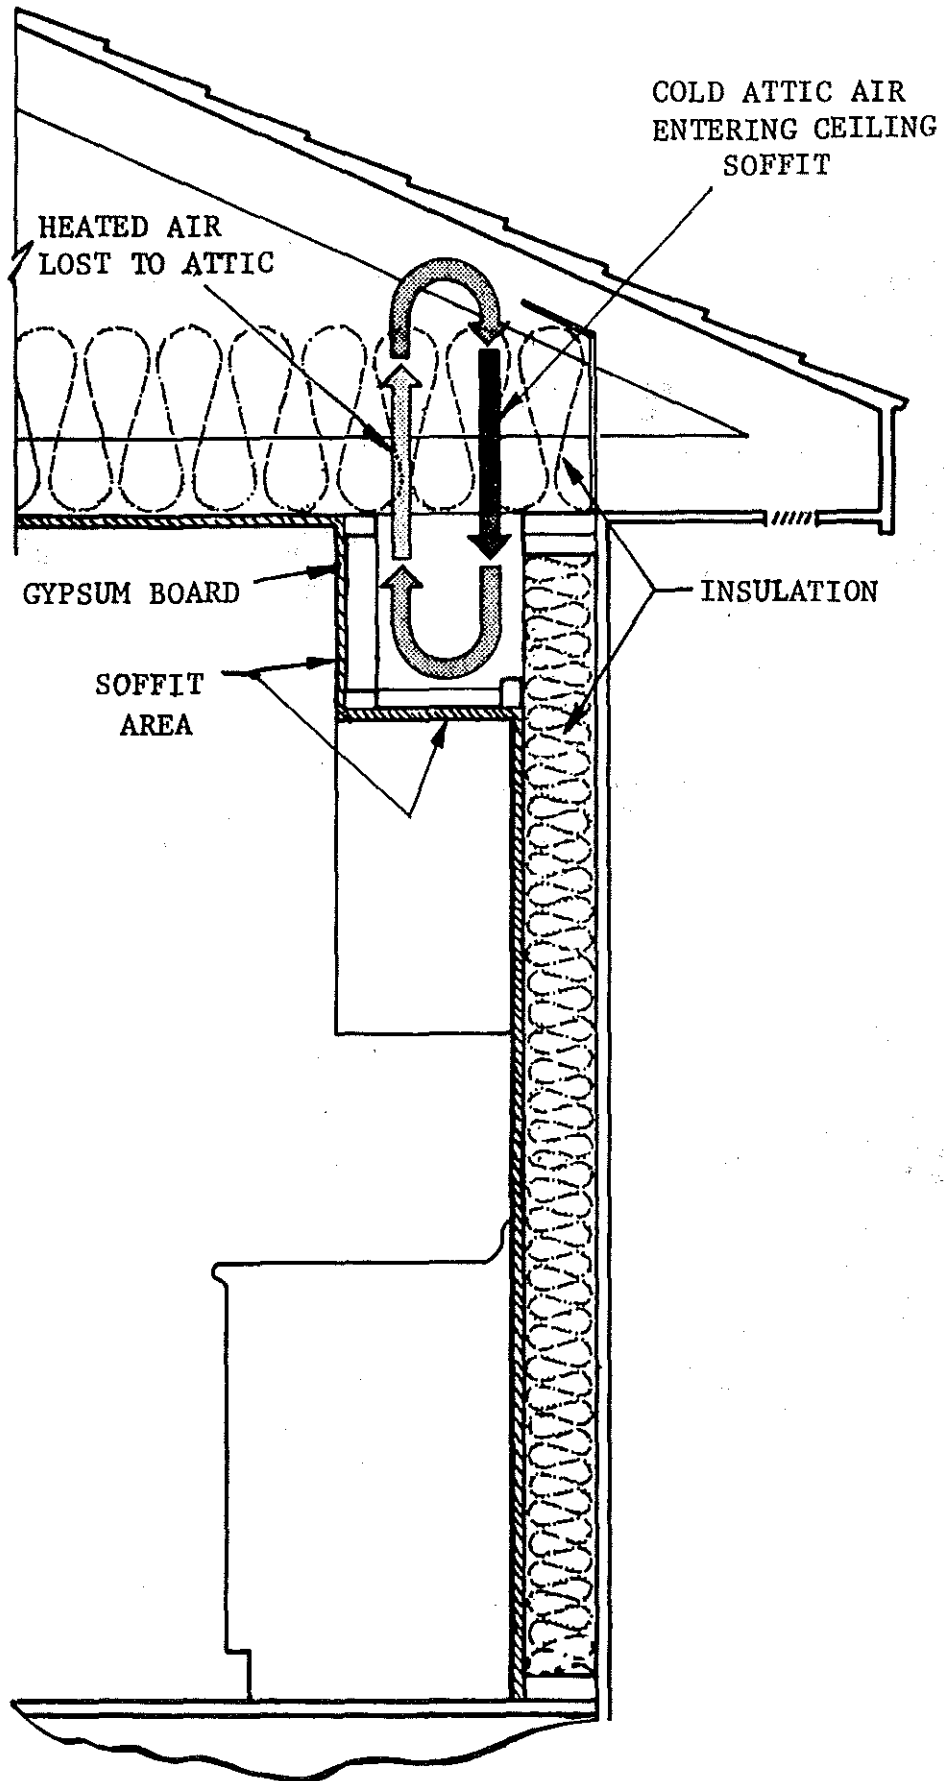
Convection loop associated with ceiling soffits above kitchen cabinets
